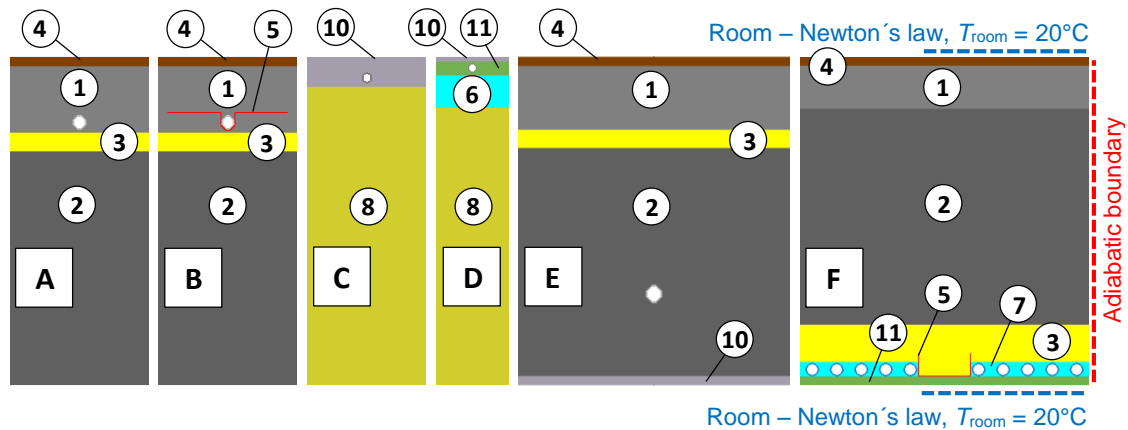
Radiant heating systems as defined in the calculation model: A – Floor, B – Floor with metal fins, C – Wall (TABS), D – Wall (air gap), E – Ceiling (TABS), F – Ceiling (TI). T_{room} – room temperature.
